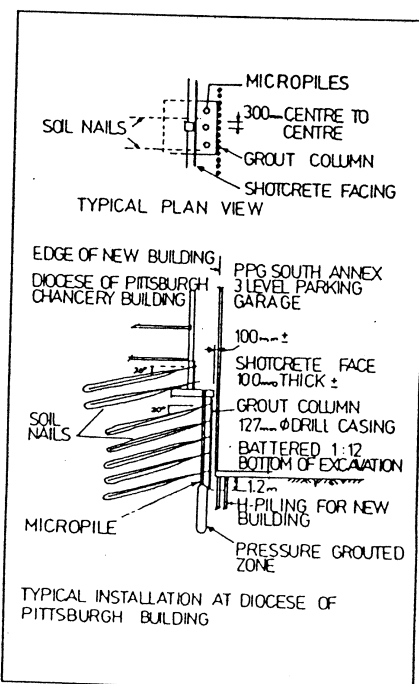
Excavation adjacent to the Diocese Building showing direct underpinning through the nailed zone to minimise settlement (Nicholson and Wycliffe-Jones, 1984)
